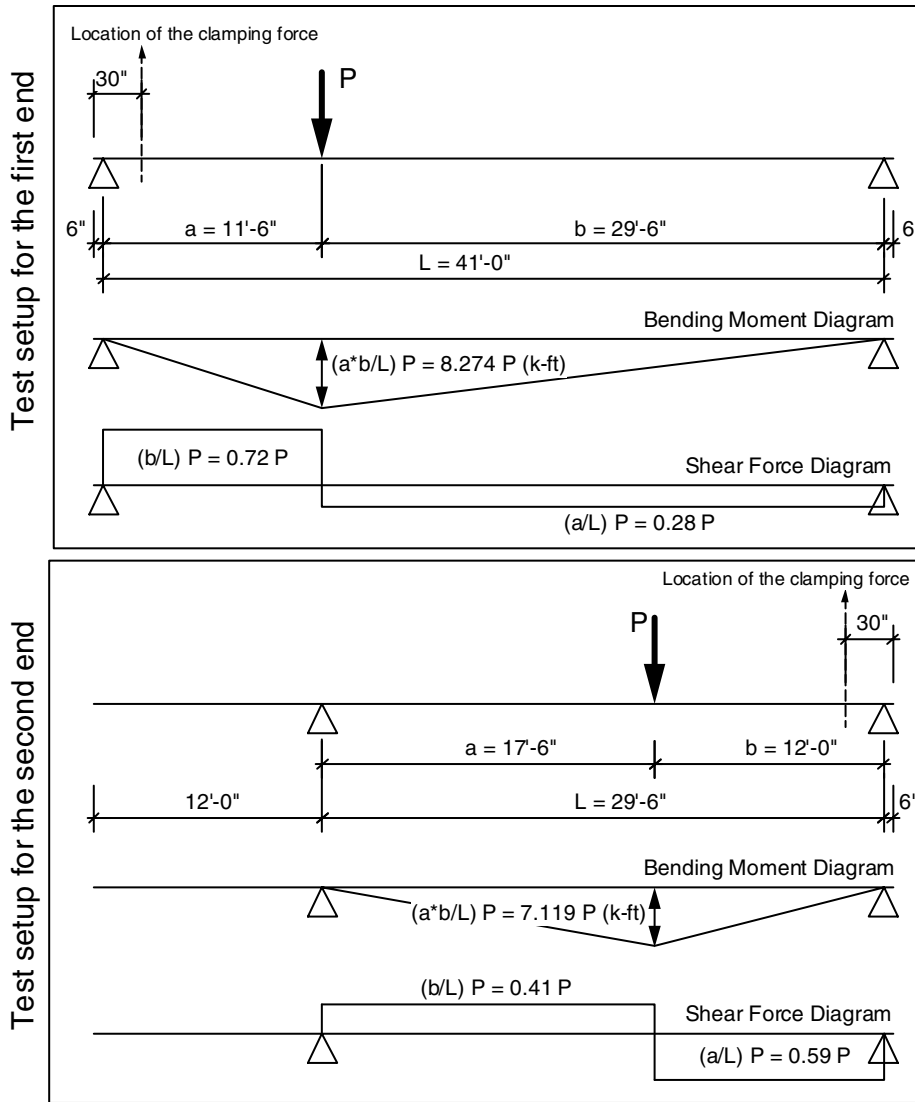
Support and loading arrangement of the full-scale specimens.
